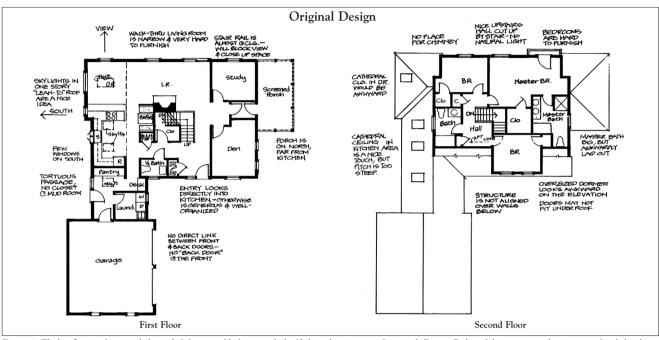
The key flaws in the original plan included: cramped bedrooms; a lack of light in the stairway and interior halls; a walk-through living room; and an impersonal and closetless family entrance. In addition, the front entry was not sheltered, and the porch was too far from the kitchen to be used frequently.
